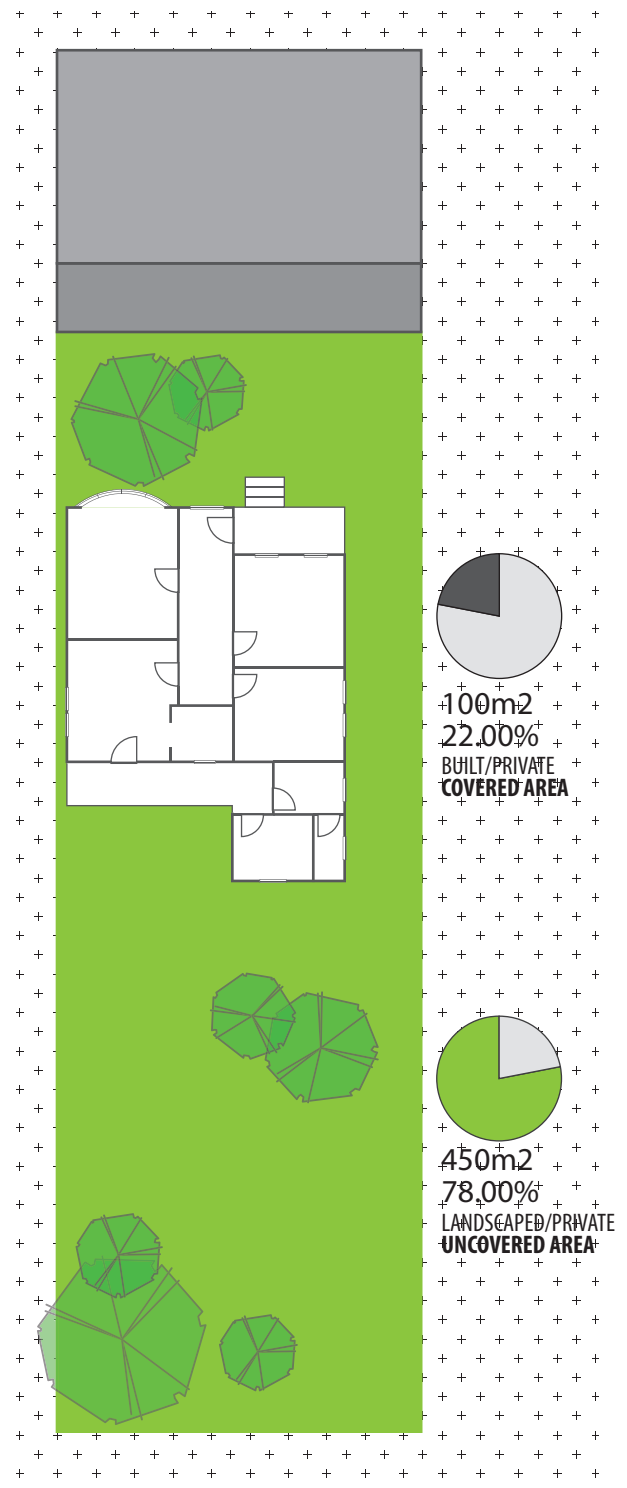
// Bungalow site placement was decidedly less dense than the villa. The housing type in Wellington is paired with larger sections and greater space between buildings. Like villas, bungalows were often oriented in relation to the street, however buildings were not offset as closely towards it as their earlier counterparts.
